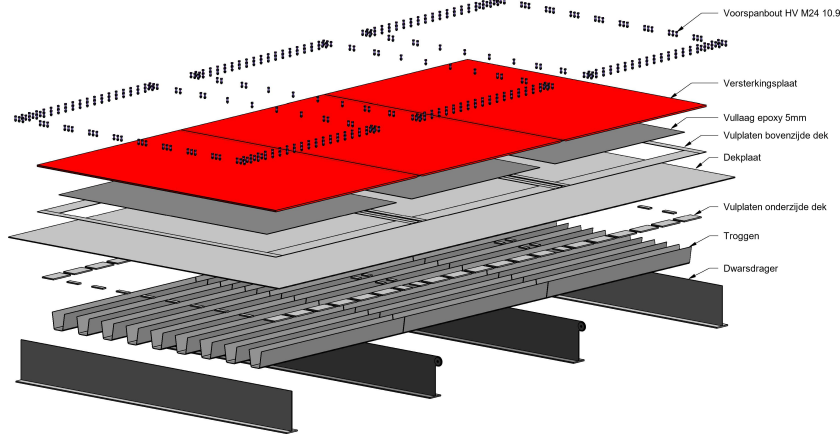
Strengthening solution with bolted steel plates for Suurhoff bridge [6]
